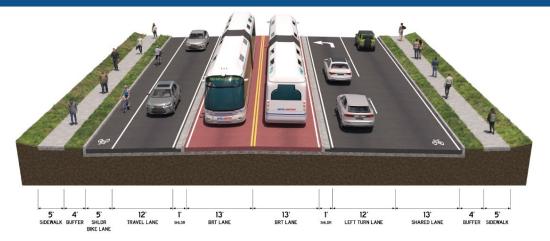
Existing and BRT Build Alternative Typical Cross Sections along Niagara Falls Boulevard near Ford Avenue
